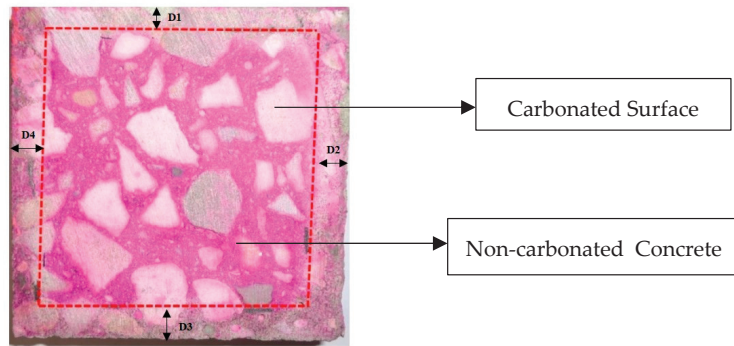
Phenolphthalein-stained concrete specimen after ACC.
